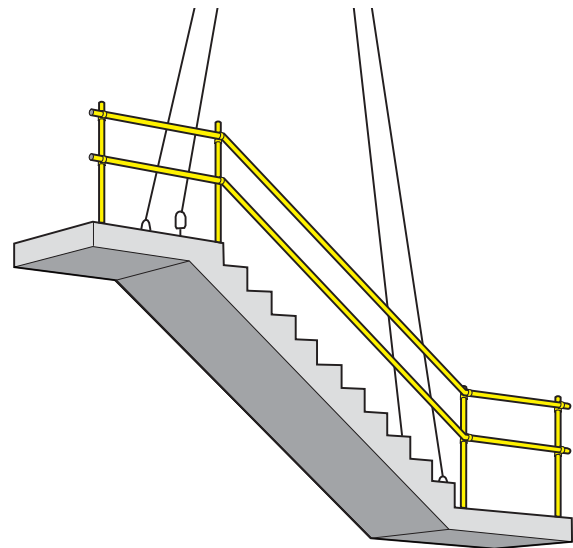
Guardrails attached to pre-cast concrete staircase sections before being lifted into place.
